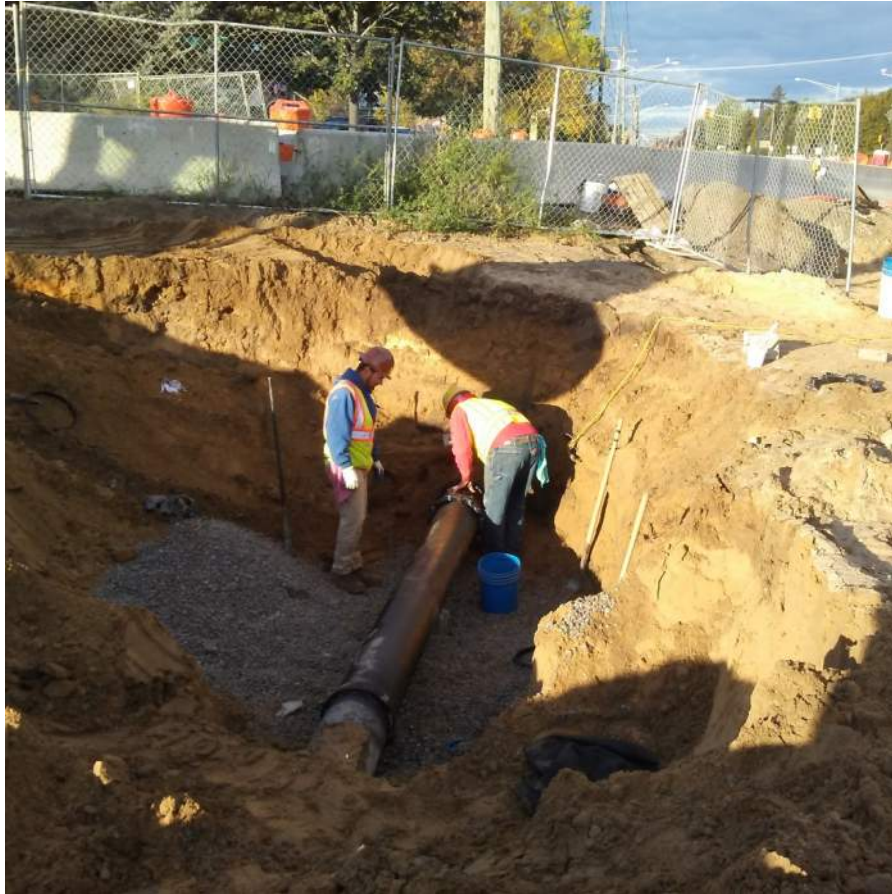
2016 Collapse – Final Water Main Connection West of the Collapse
